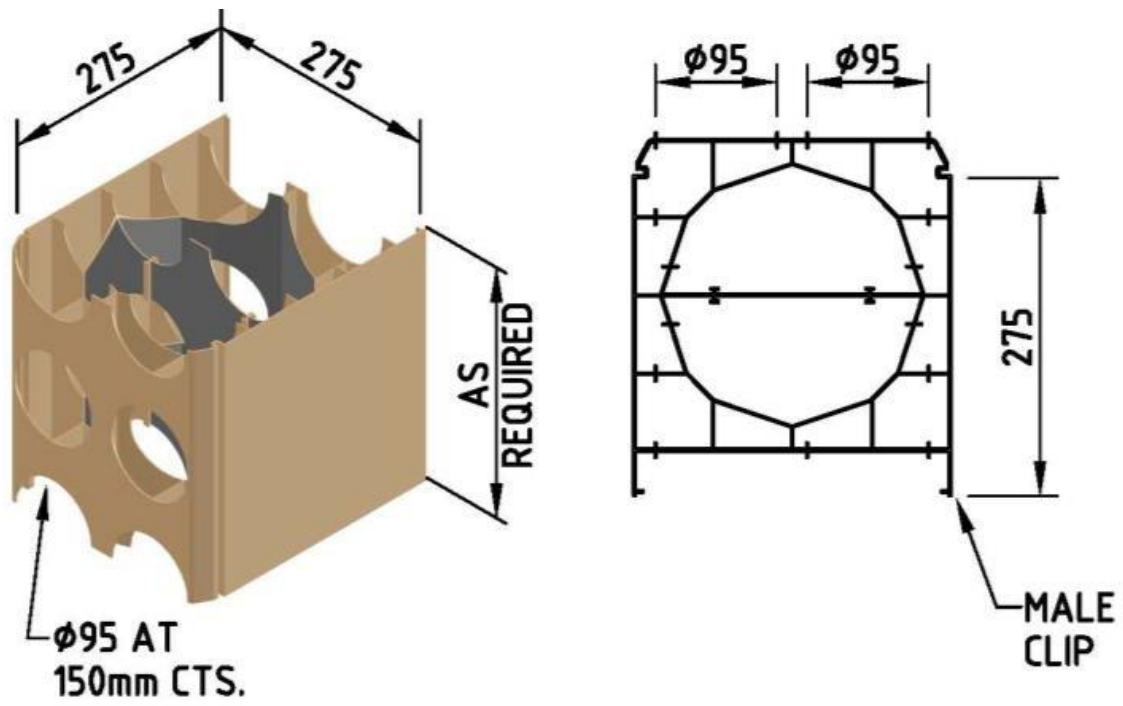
Details and dimensions of 275mm Dincel structural walling panels [13]
